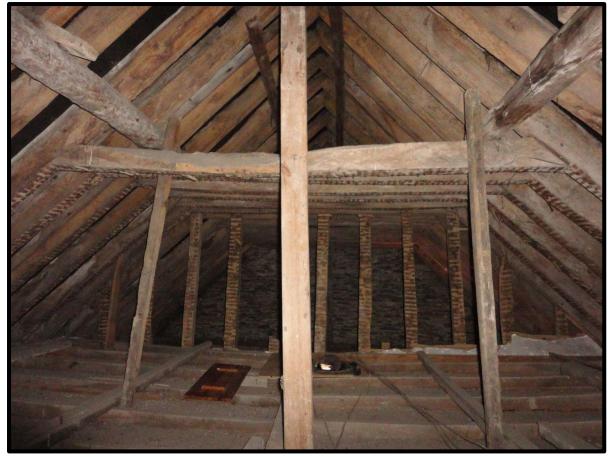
View of the roof structure over the west wing showing the inserted flat ceiling in the southern part of the first floor and the evidence for lath and plaster forming a high, canted ceiling. The 'purlins' on either side are modern insertions.
